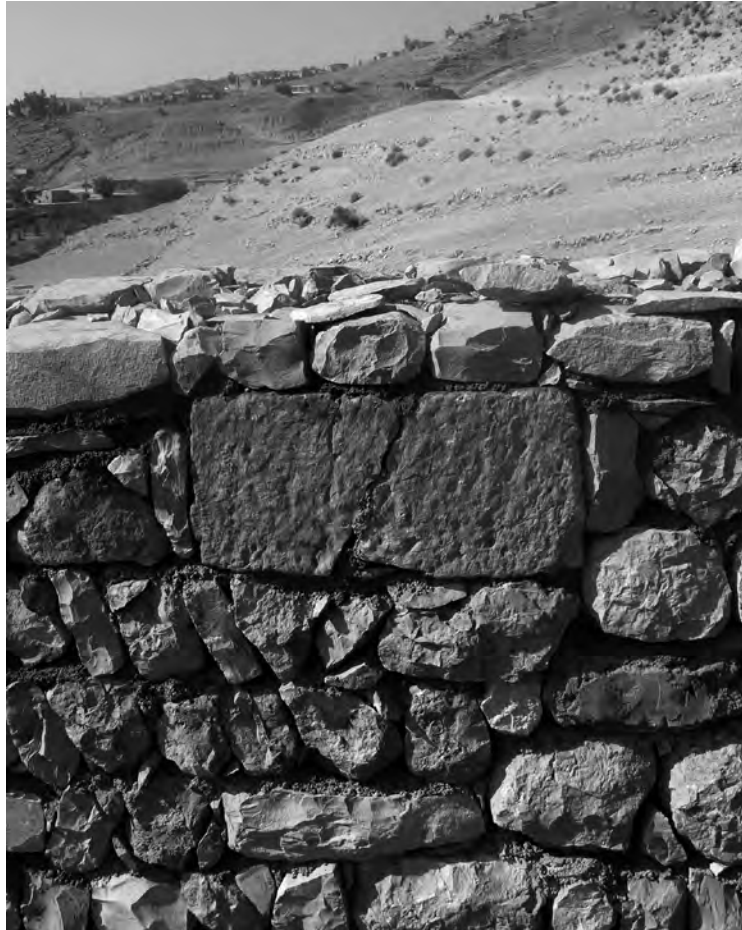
Ancient stone block of masonry reused in the wall of a modern house at the feet of the Upper Terrace
